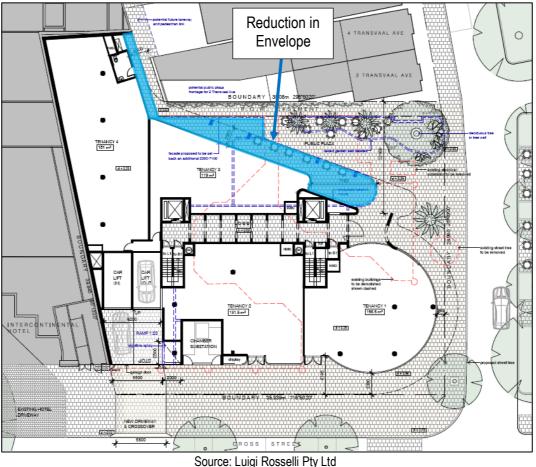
Ground Floor Plan Showing Original and Proposed Envelope
